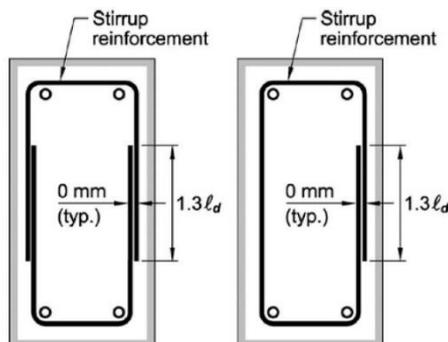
Beam subjected to torsion where closed stirrups should be adopted.
